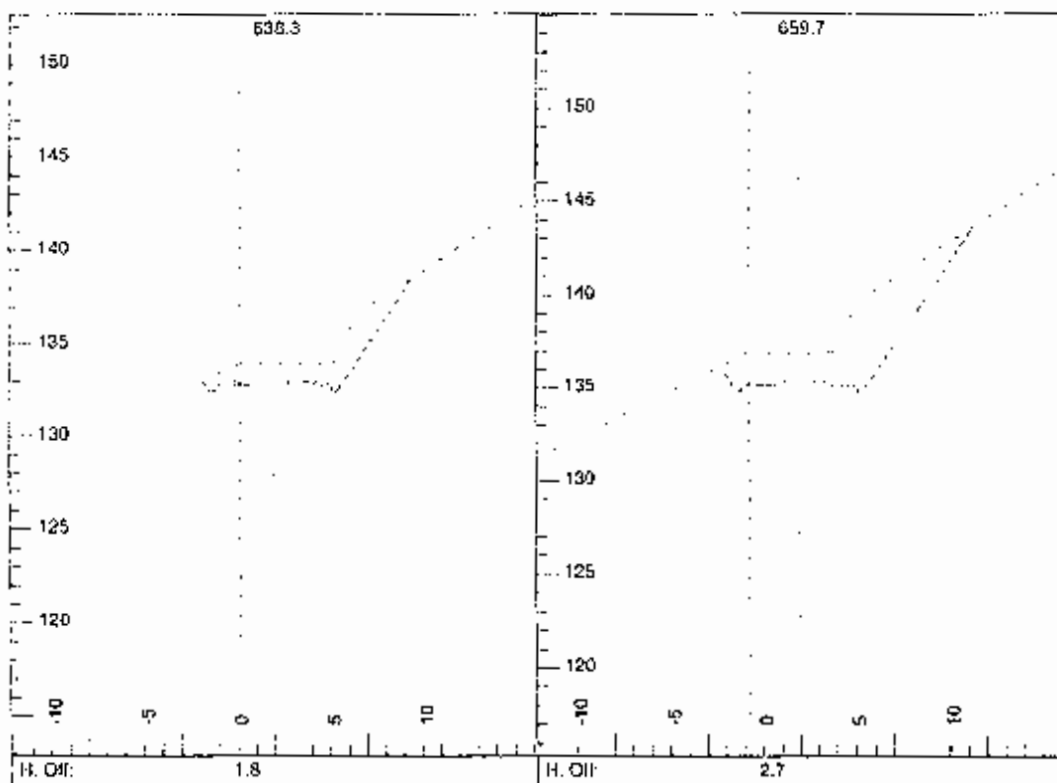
Typical cross-sections generated in ROADENG version 2.0.
